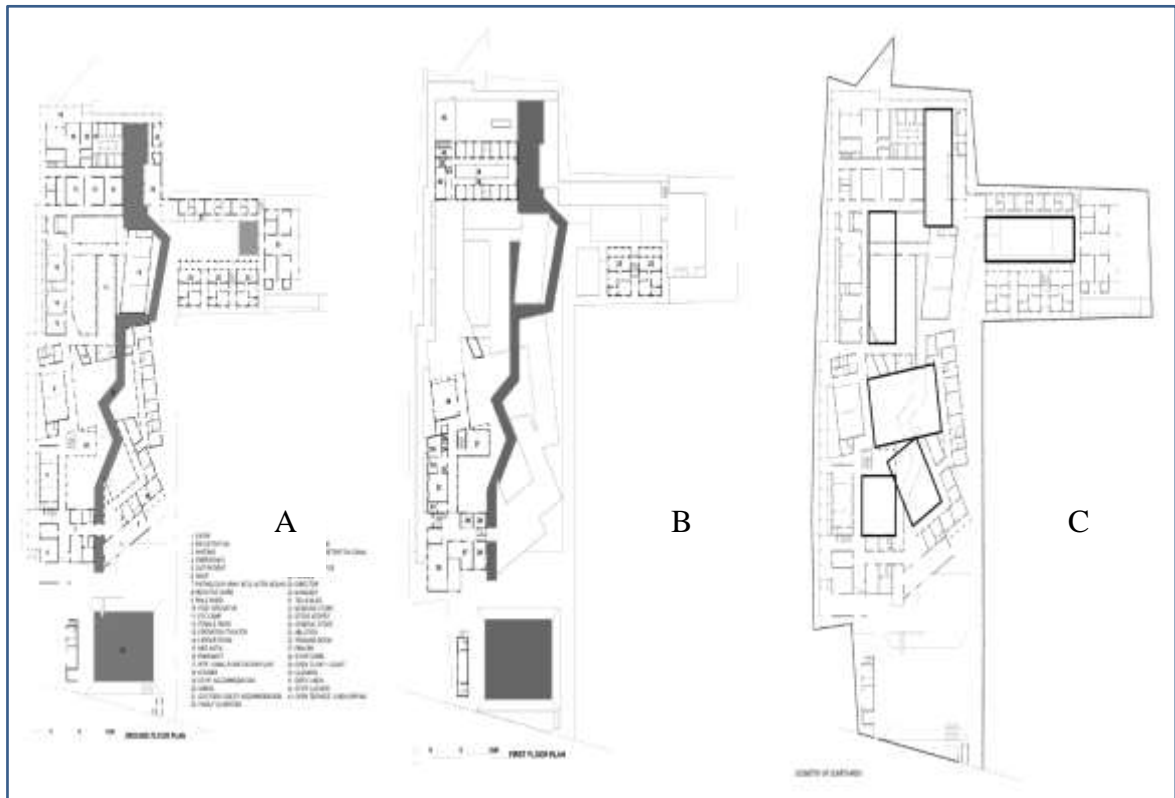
Plans of Friendship Hospital (A) First Floor Plan (B) Second Floor Plan (C) Geometry of Courtyards (Archdaily, N.D.-B).
